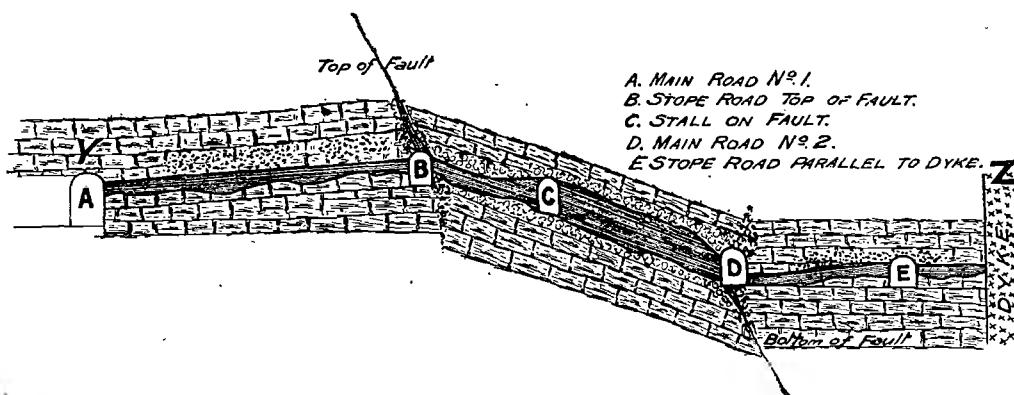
FIG. III.—Section from Y to Z. Scale 250 ft. to 1 foot.
